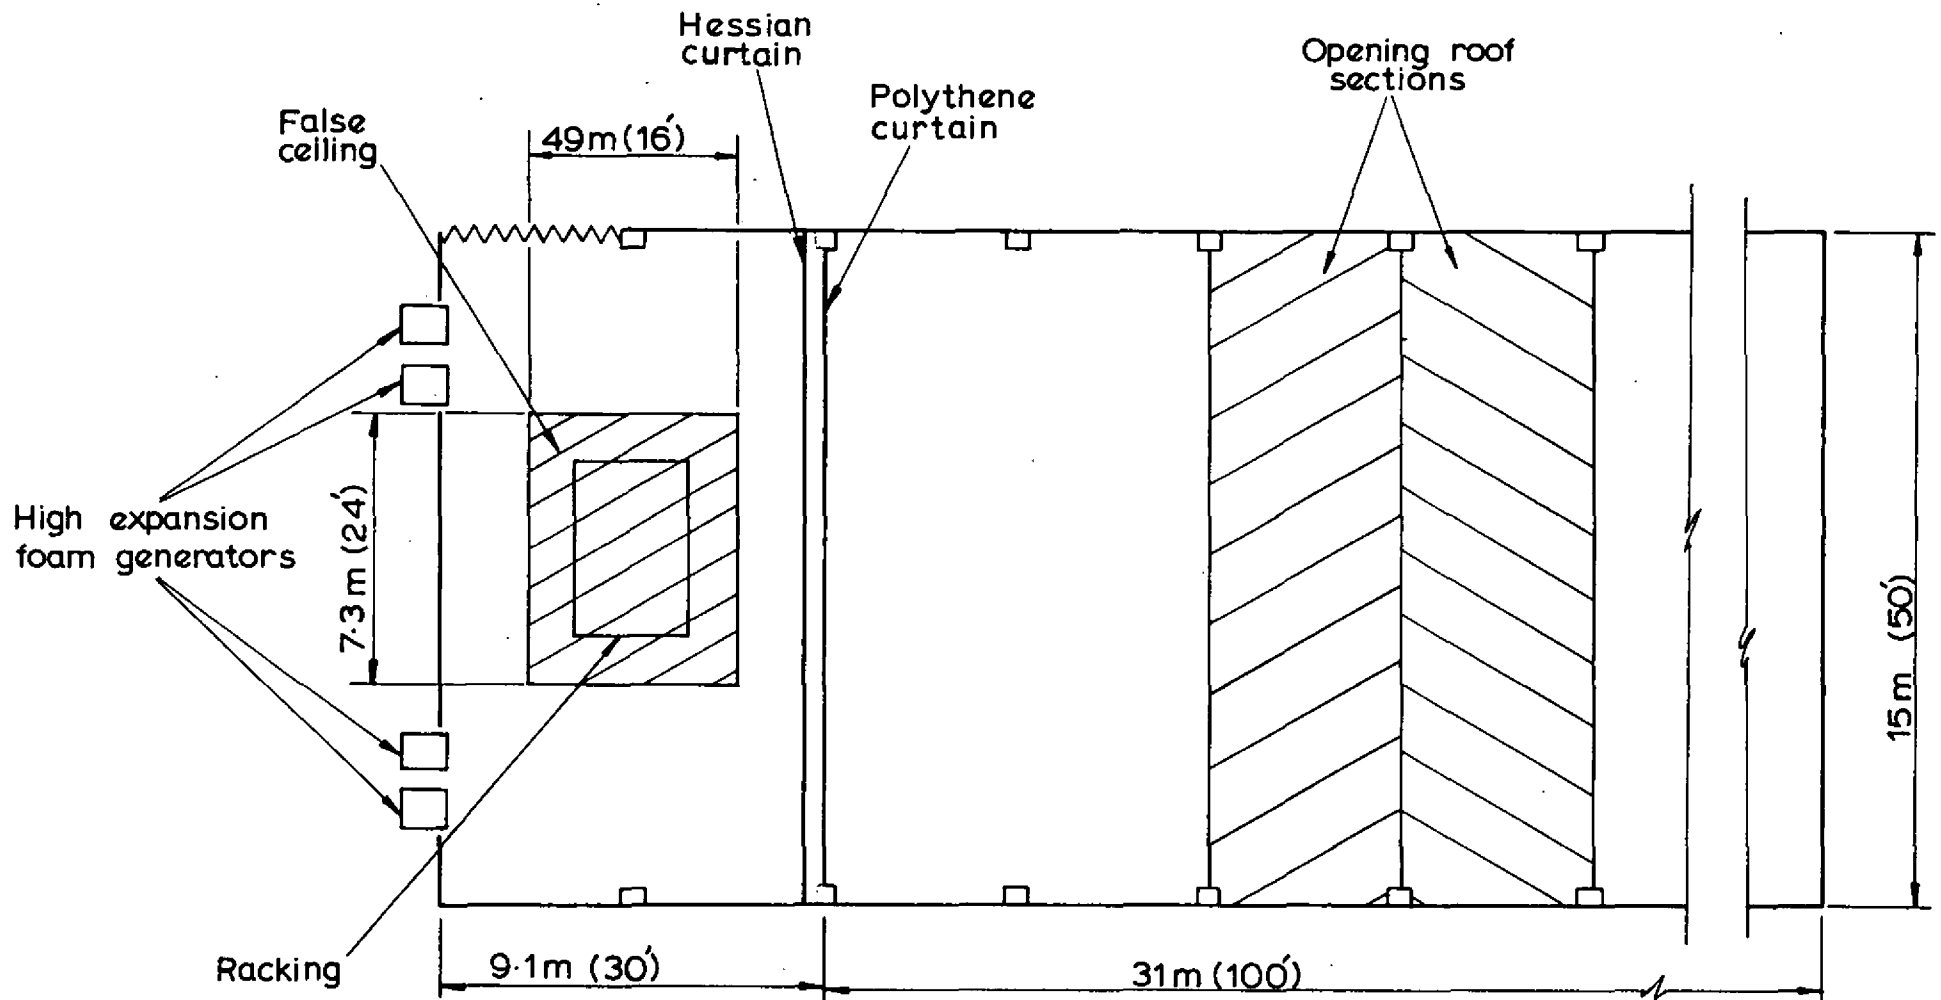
PLAN VIEW OF LABORATORY RACKING AND GENERATORS
